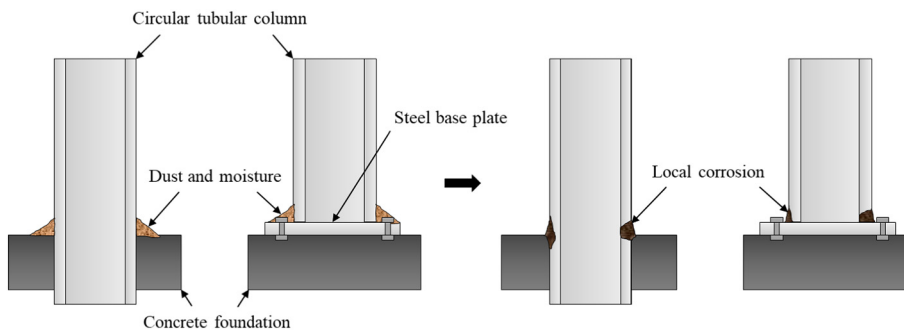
Occurrence of local corrosion at the bottom end of a column in contact with a horizontal member.
